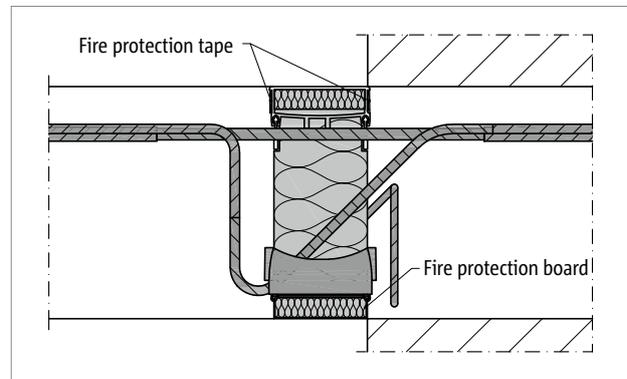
Schöck Isokorb® T type K-E, K-T for REI120: Detail 1
